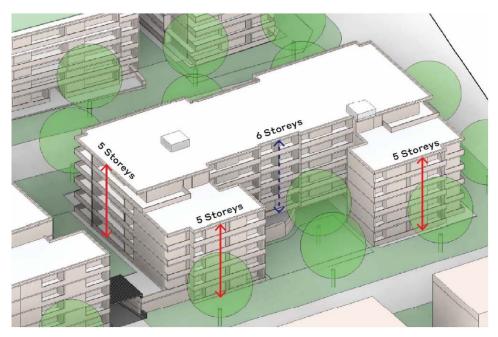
Modelling of Building I demonstrating how the building presents as 5 storeys to each of the street frontages, with the sixth storey only interfacing with internal areas of the site Source: Kannfinch + Ethos Urban
